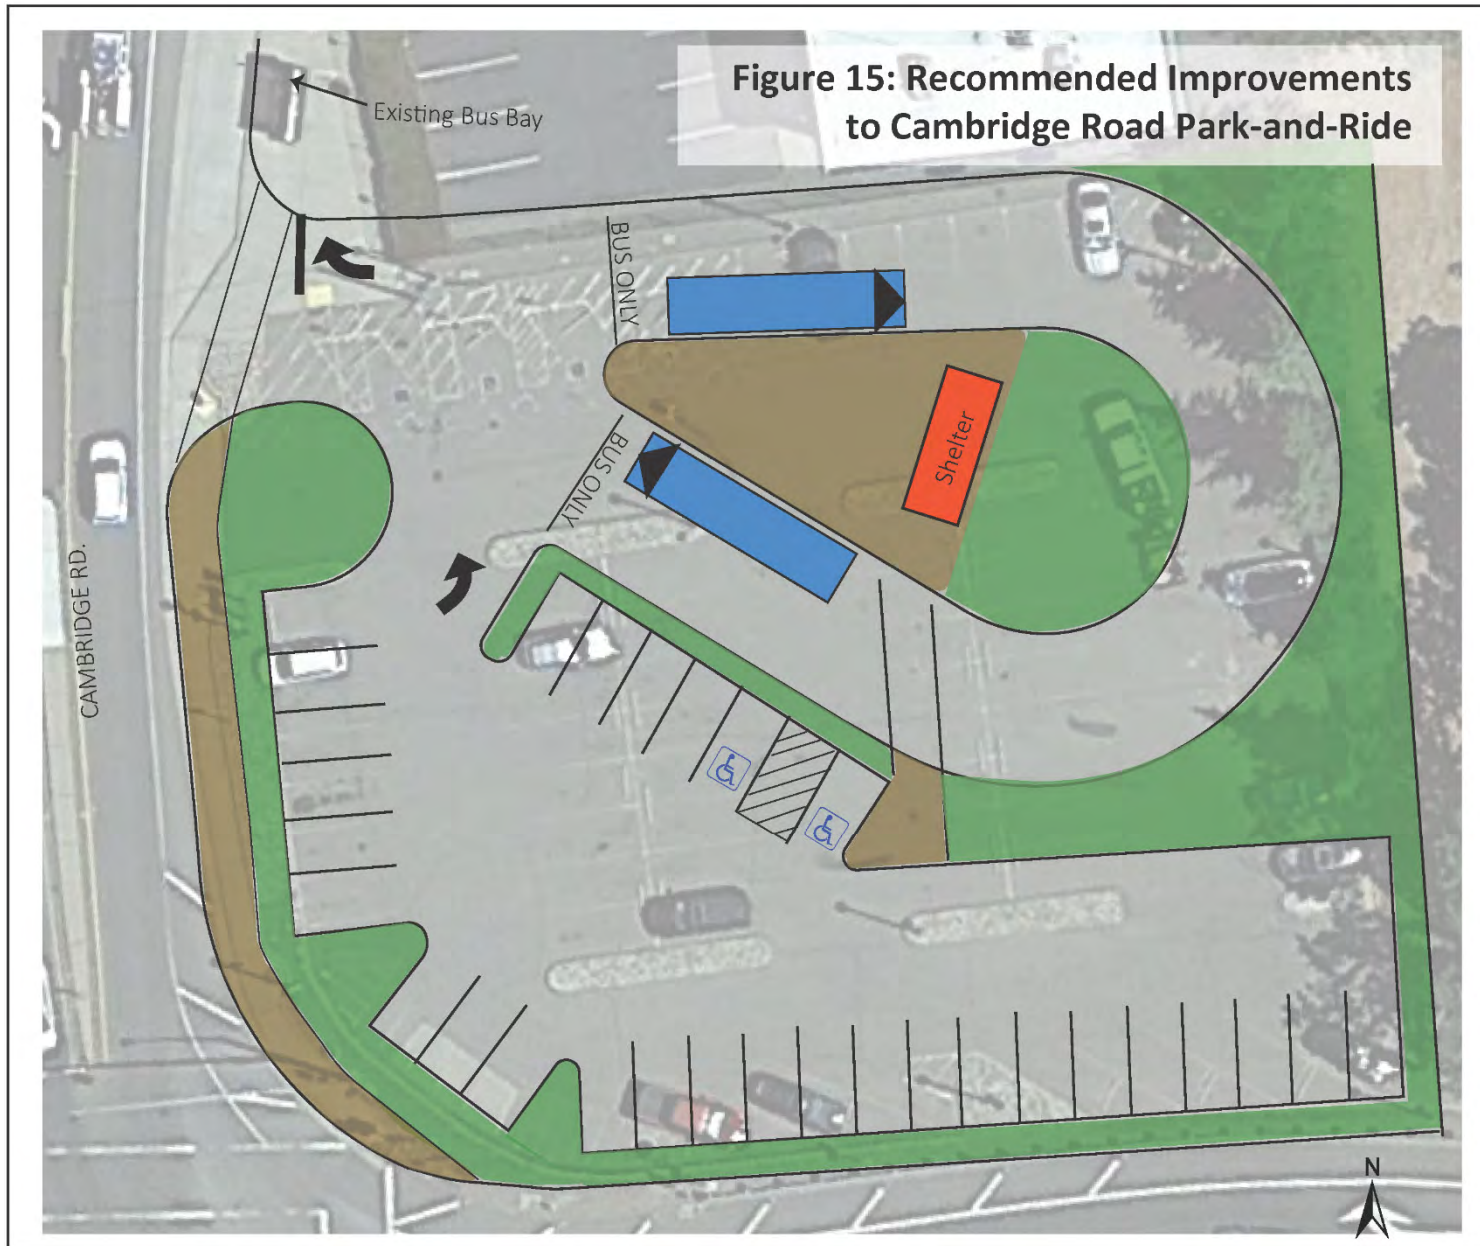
Recommended Improvements to Cambridge Road Park-and-Ride
